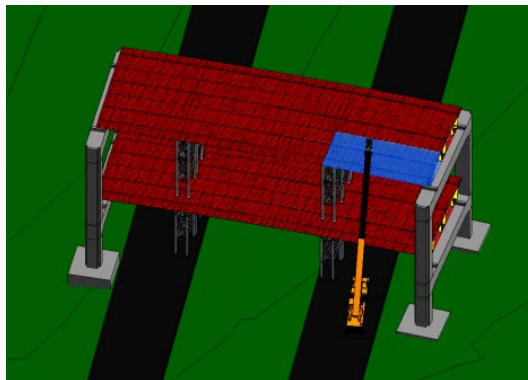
BIM model for hoisting of section III in upper left steel box girder
